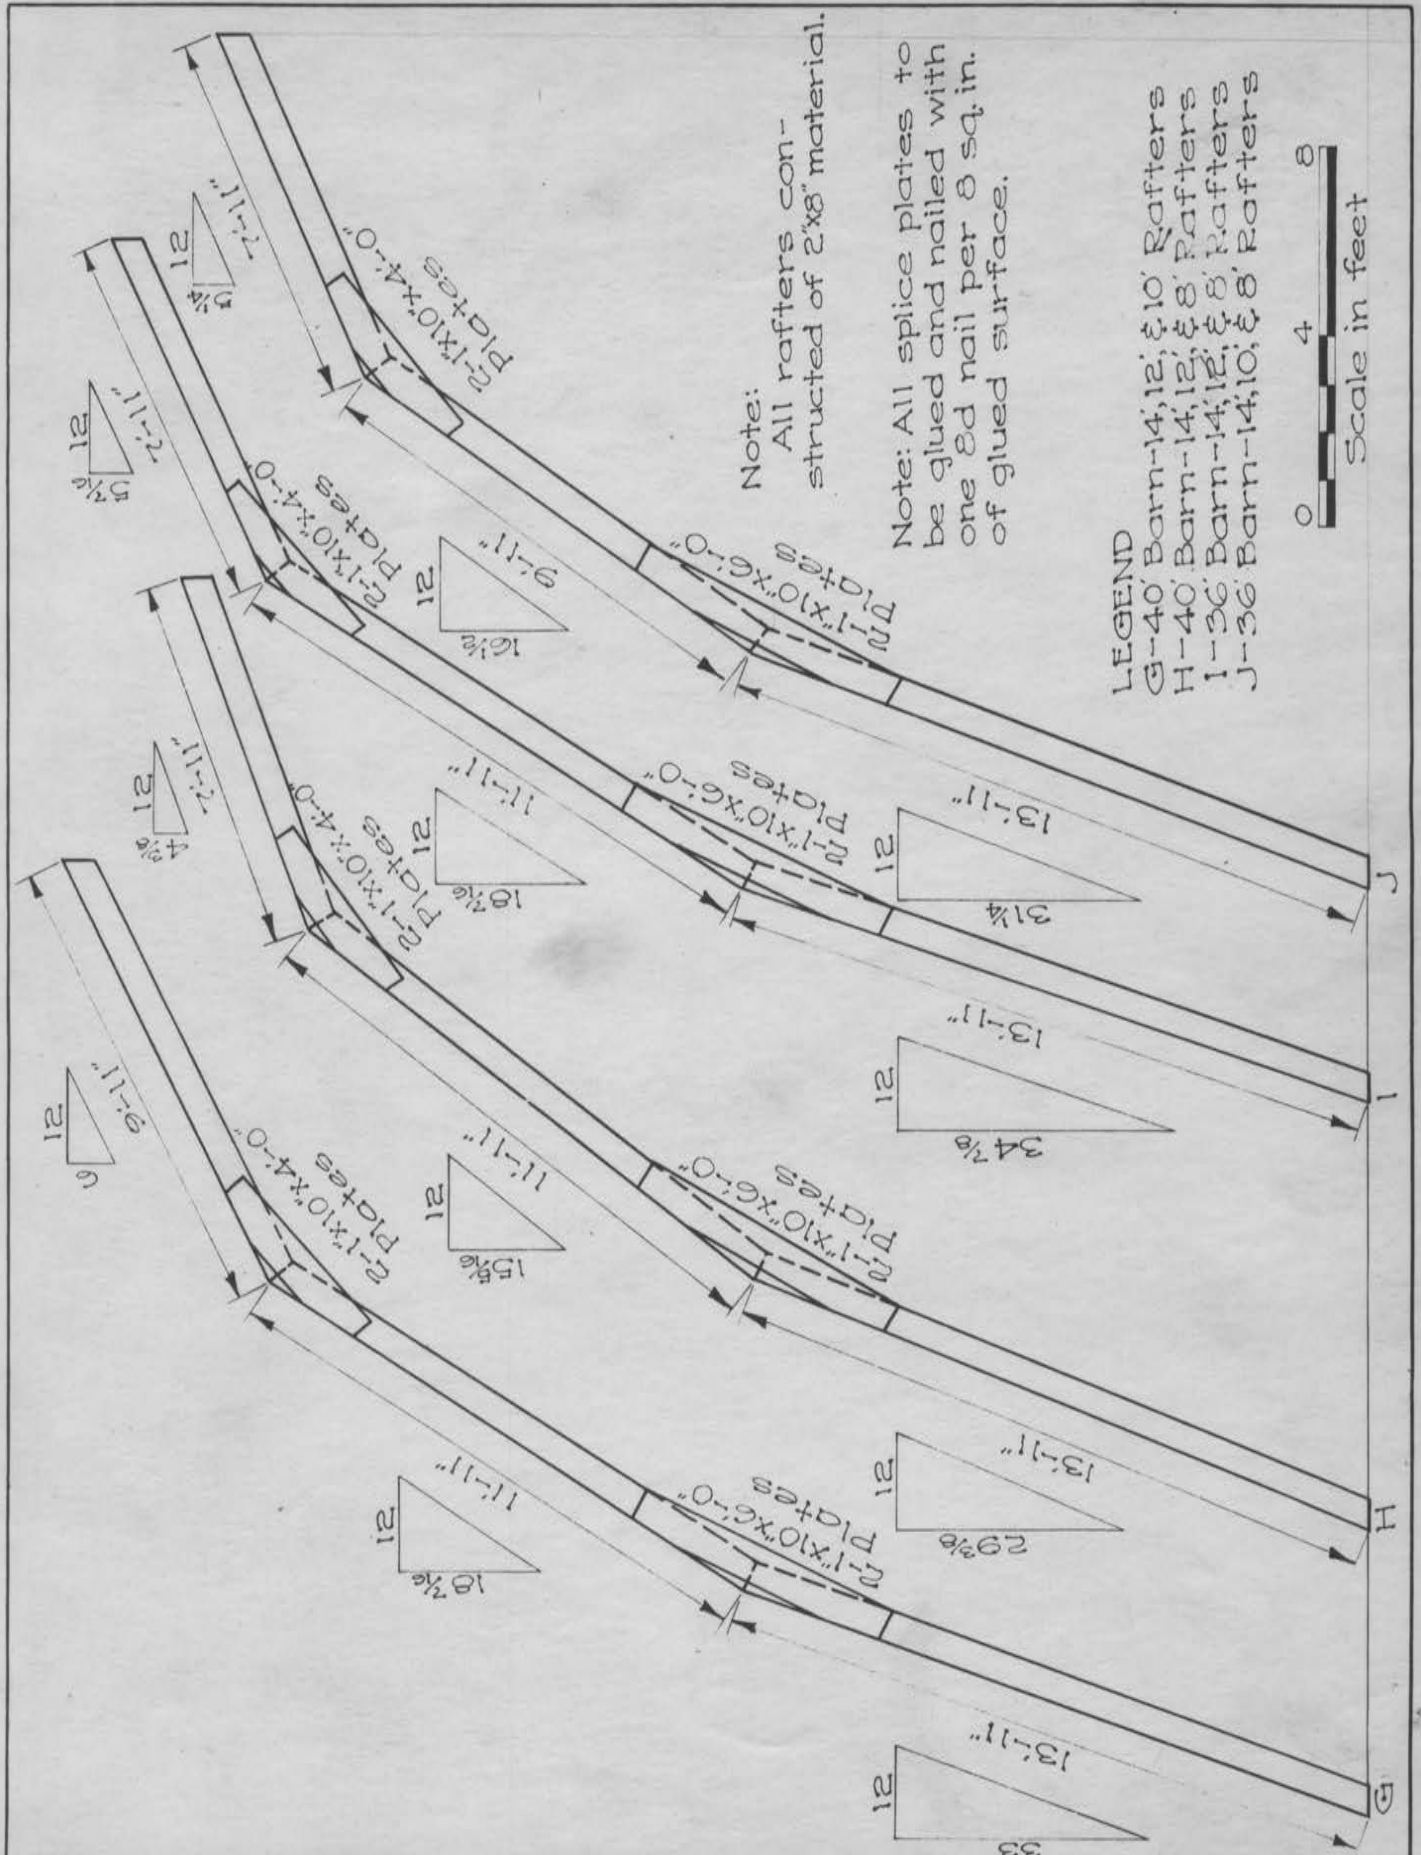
Detail Plan of Rafters-36' & 40' widths.
